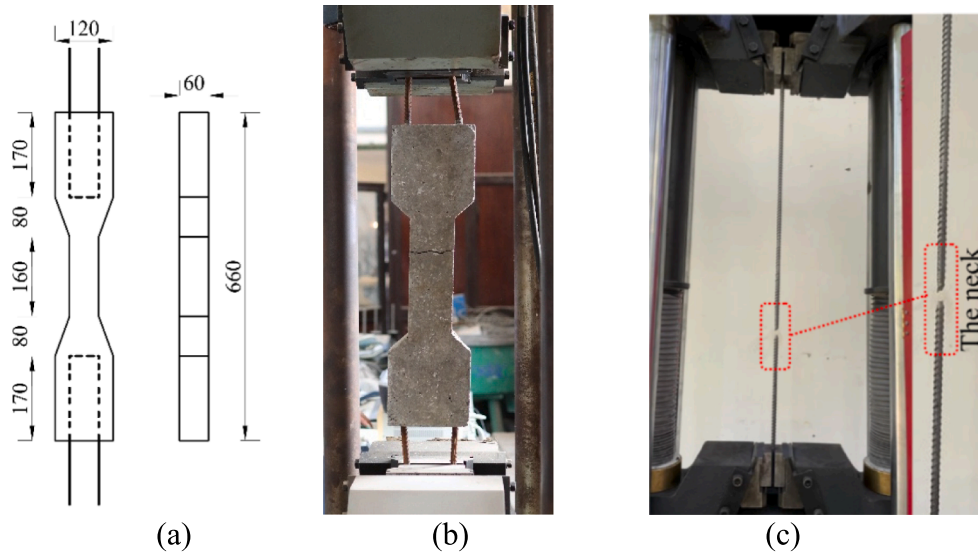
Material tensile tests: (a) concrete dimensions; (b) test set-up and failure model of NC; (c) tested steel bar.
